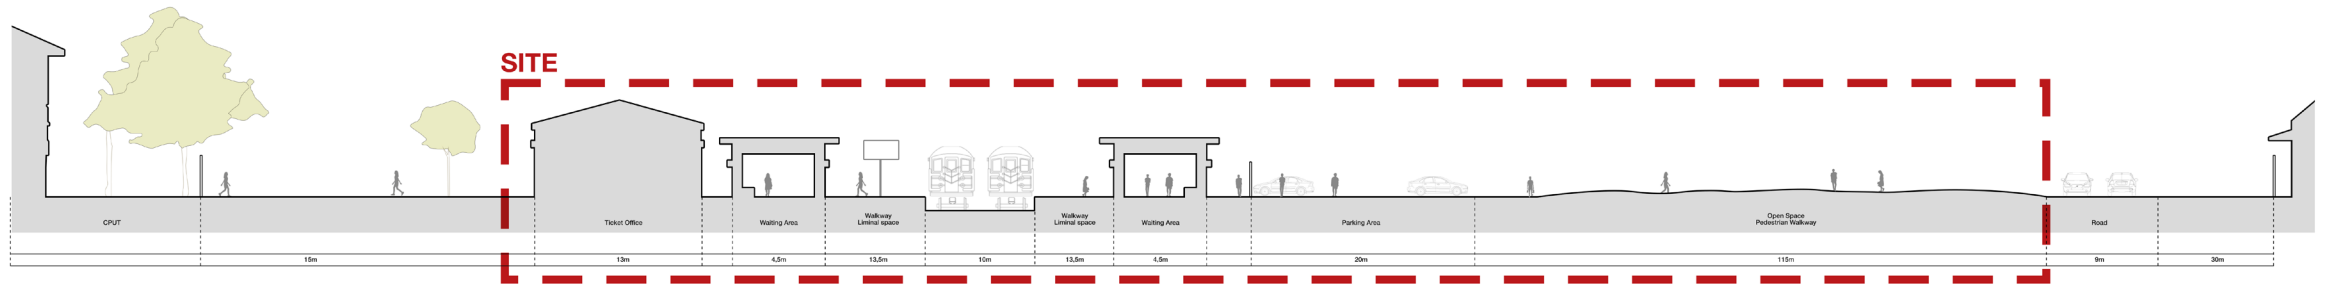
Davis, S (2023). Section cut along Pentech Metrorail Station site
